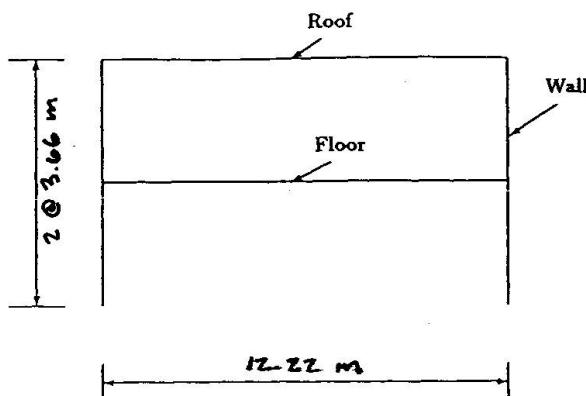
East-West Cross Section of the Gilroy Historic Commercial Building
